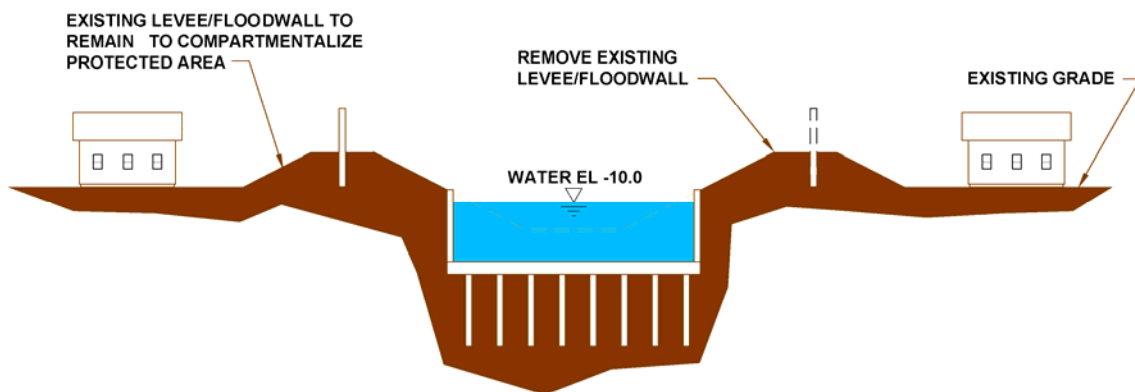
Option 2 Typical Canal Cross Section
